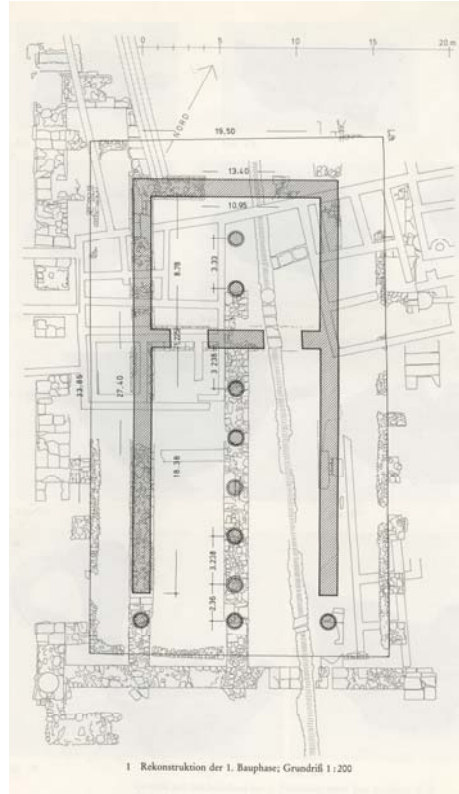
Plan of Nordbau (Furtwängler and Kienast 1989)
